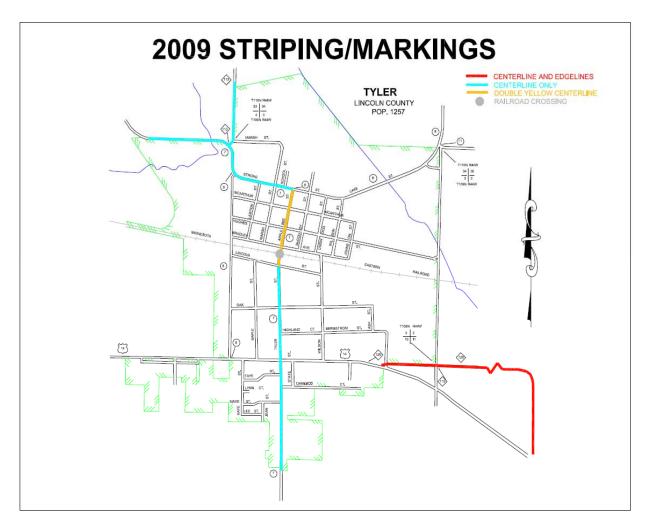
CAD used to identify annual pavement marking plan for Tyler in Lincoln County (specific section map)
